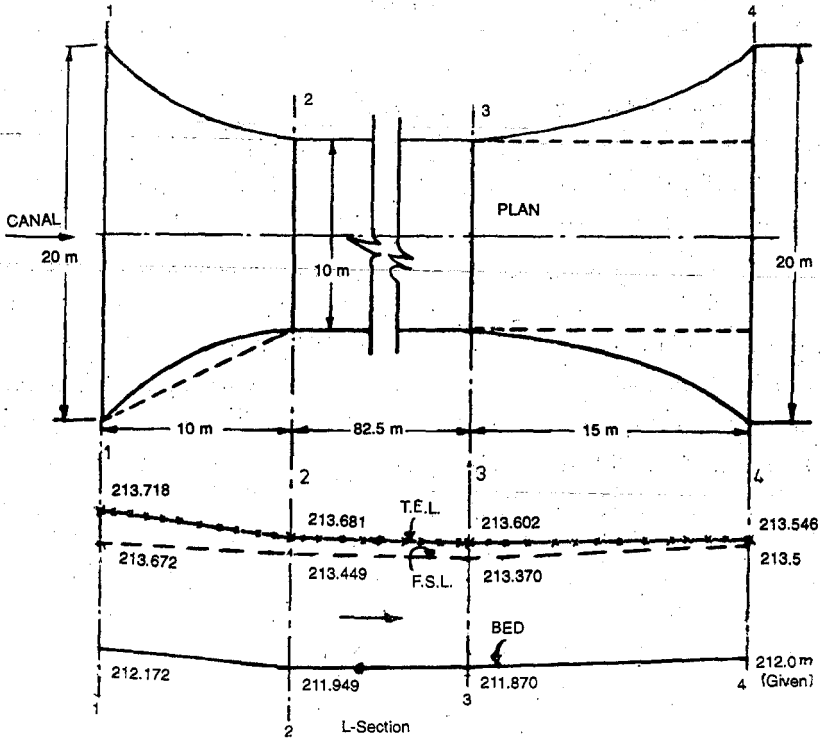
Plan and Section of Canal Trough in Example 14.1.
